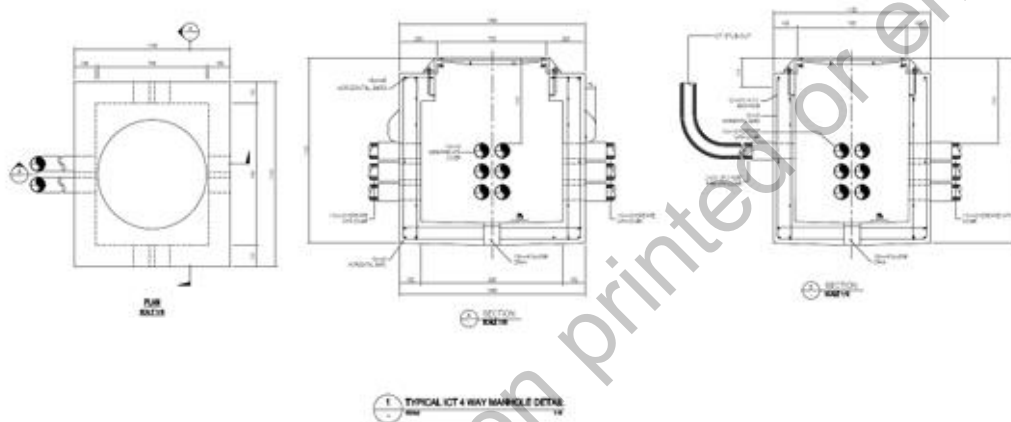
Typical ICT Manhole, 4-way (road intersections)
